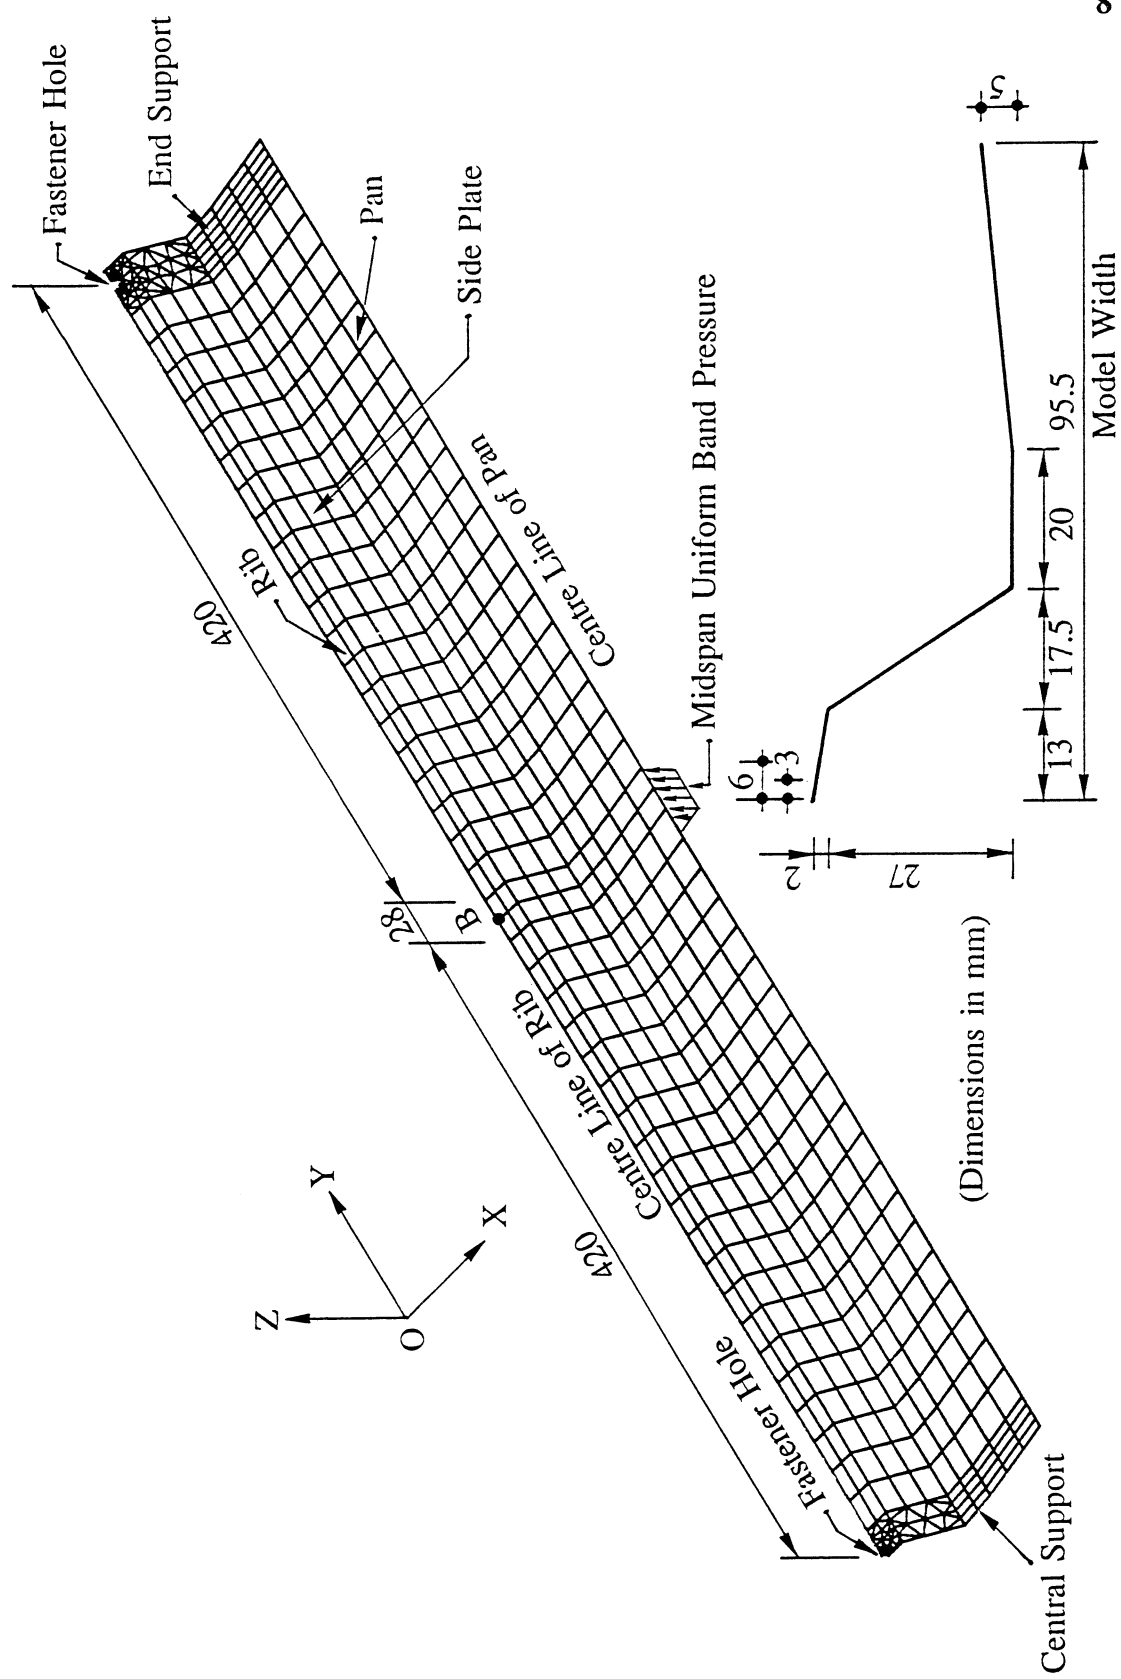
FINITE ELEMENT MODEL OF RIBBED PROFILE ROOFING SHEET
